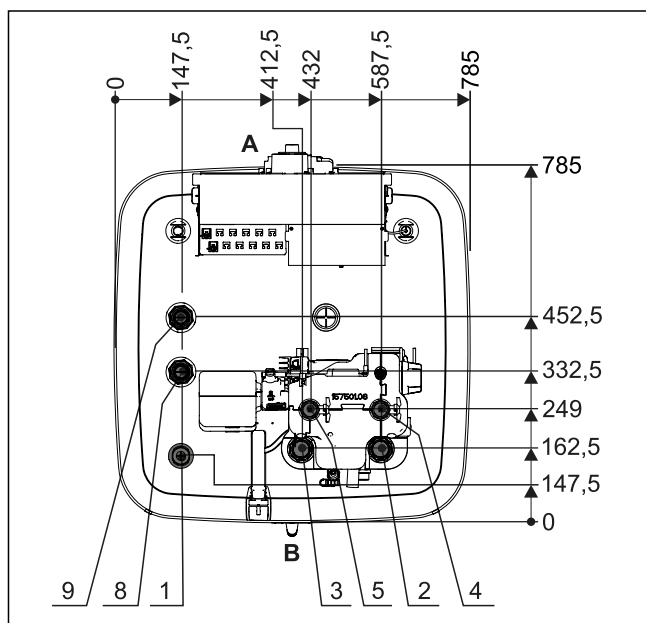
Dimensions, top of unit – type ETS(X/H)B16P50D
